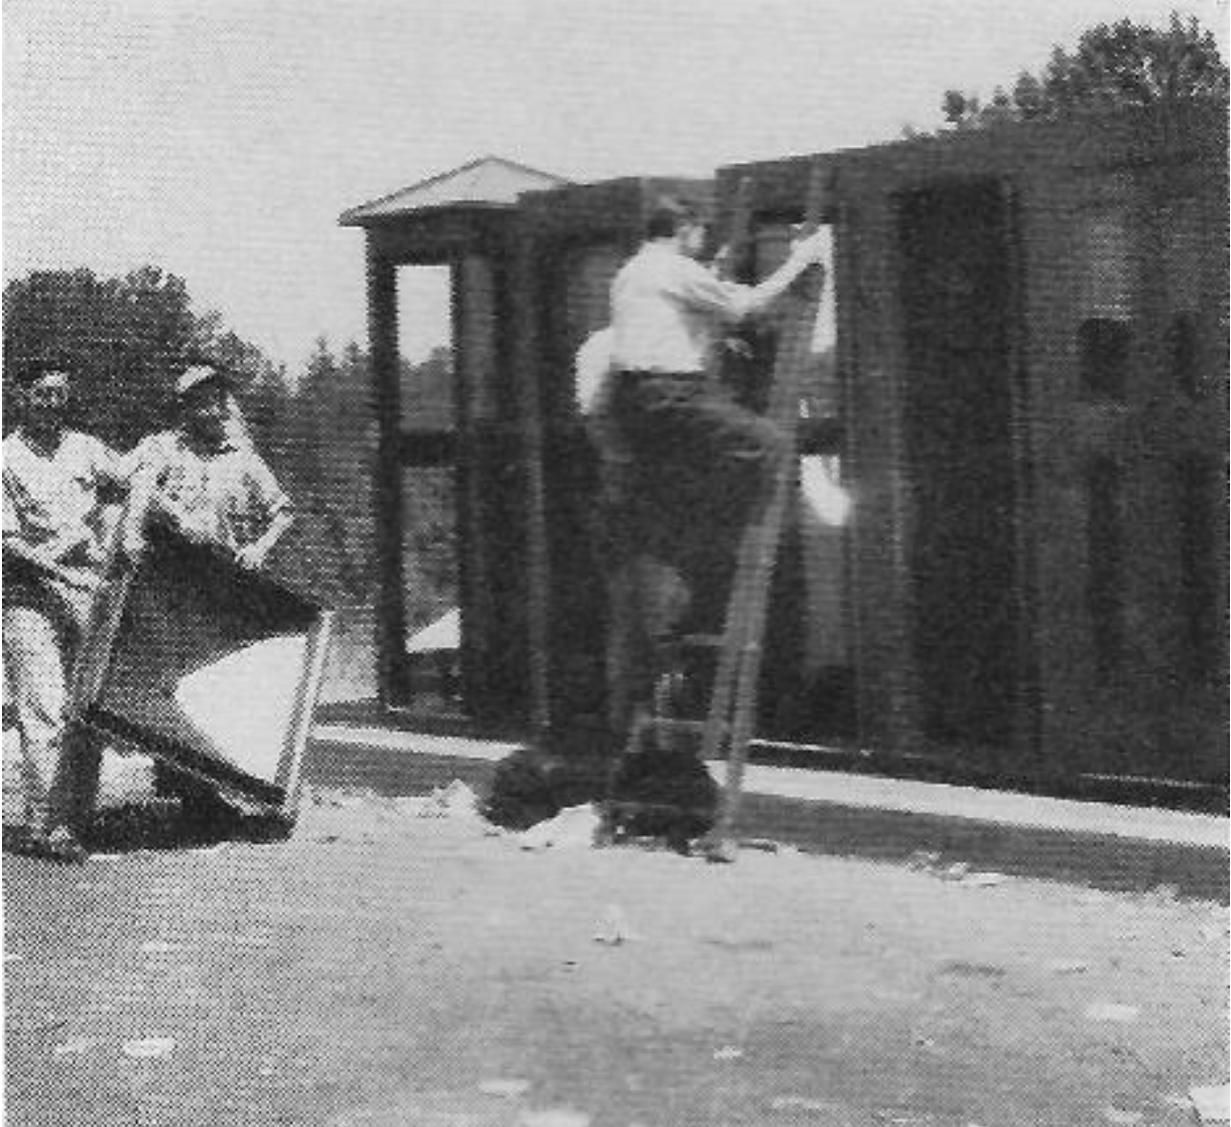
Building telephone booths on the Denver Avenue fill. Six booths were set up overlooking flooded Vanport to serve relief workers, law enforcement, and reporters.
